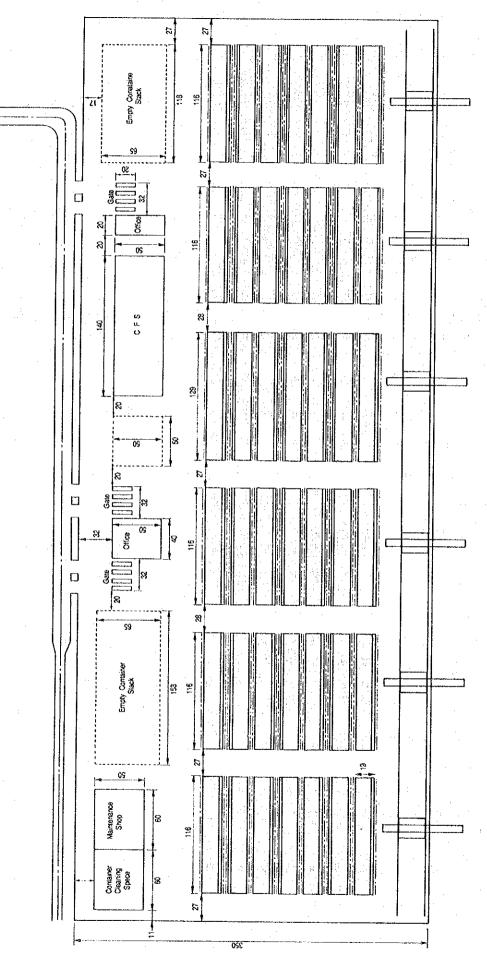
Basic Layout of Major Facilities (2010)
